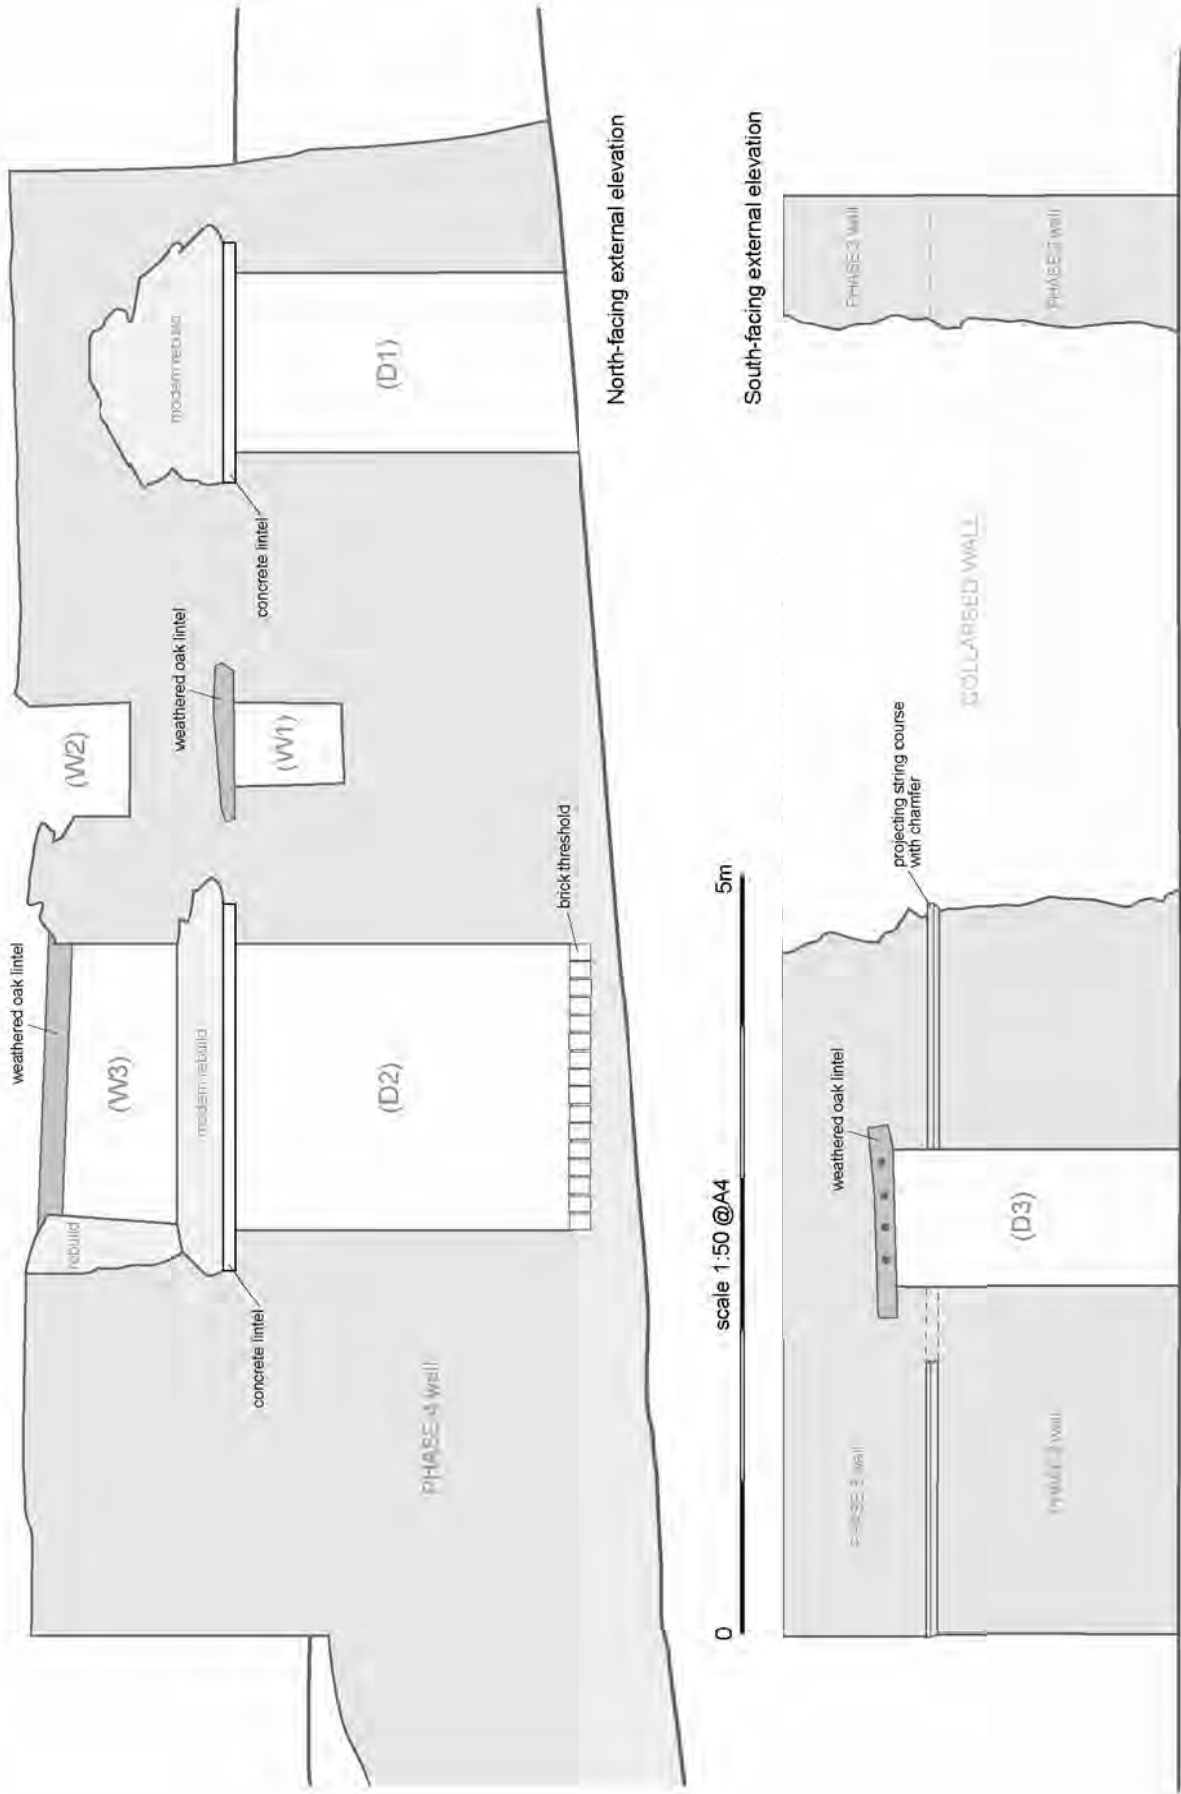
North- and south-facing external elevations (based on architects drawings, with additions).
